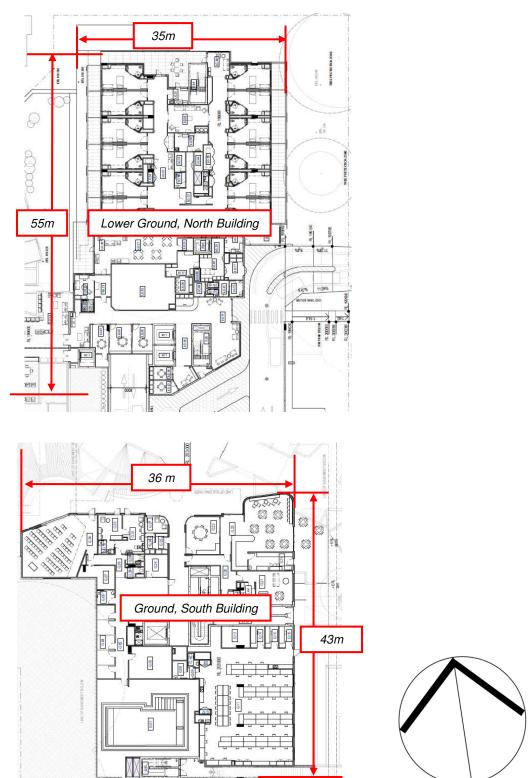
Lower Ground (top) and Ground floor (Bottom) plans with the plan-form dimensions overlaid.
